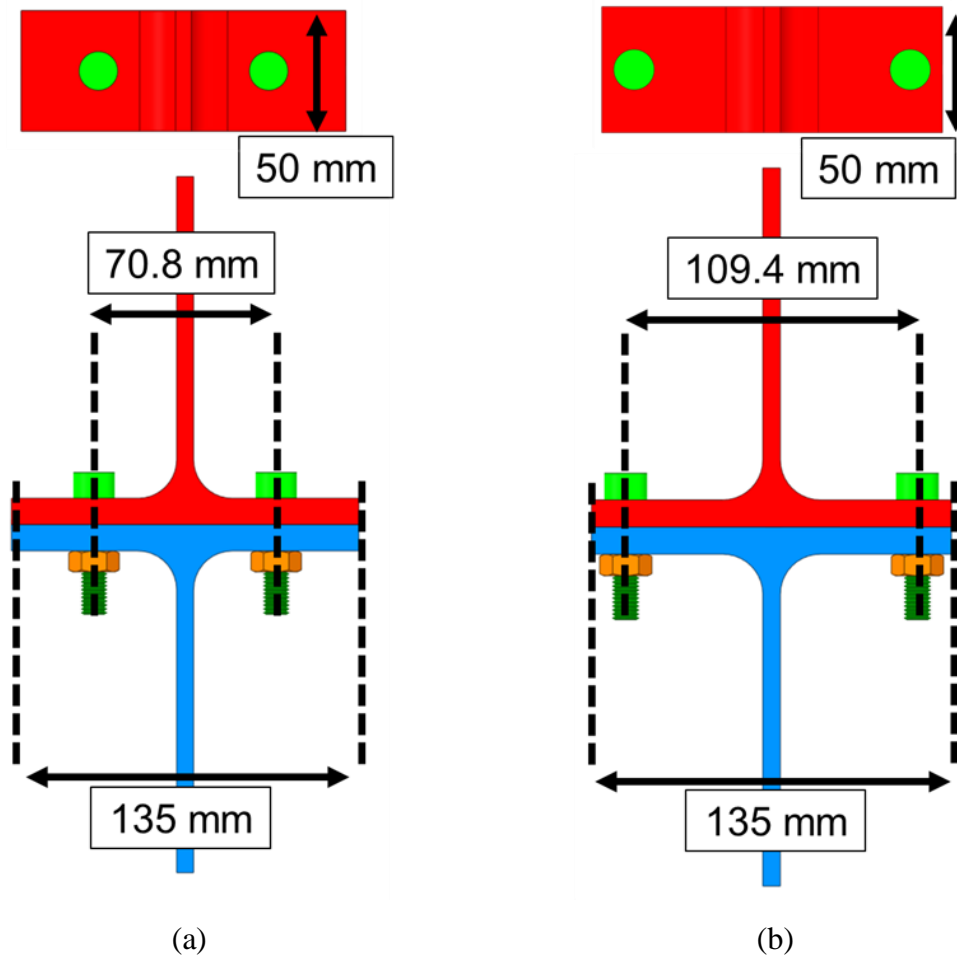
Dimensions of the T-Stub assemblies for (a) lower eccentricity, (b) higher eccentricity.
